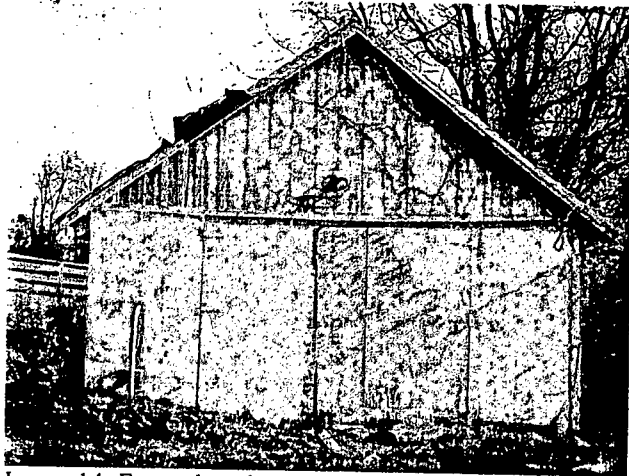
Front elevation of the garage (likely 2nd quarter, 20th century) with non-original doors, board-and-batten siding, and metal roofing.
